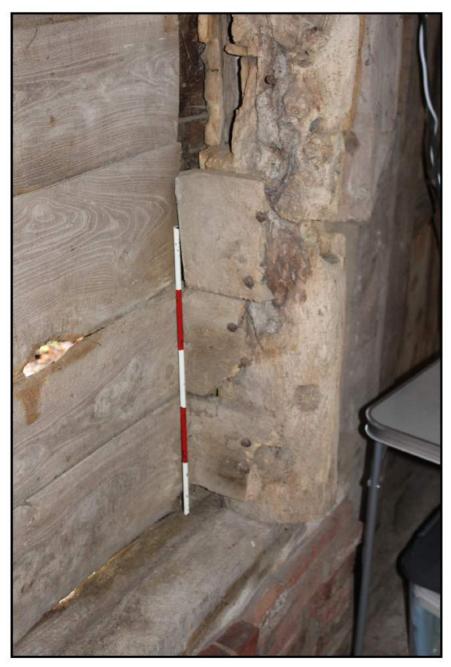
Barn interior; north-west elevation, south-west end, detail of possible cornhole
